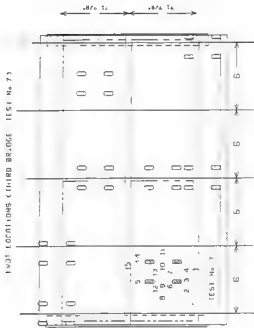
LVDT Locations (Third Bridge - Test No 7)
